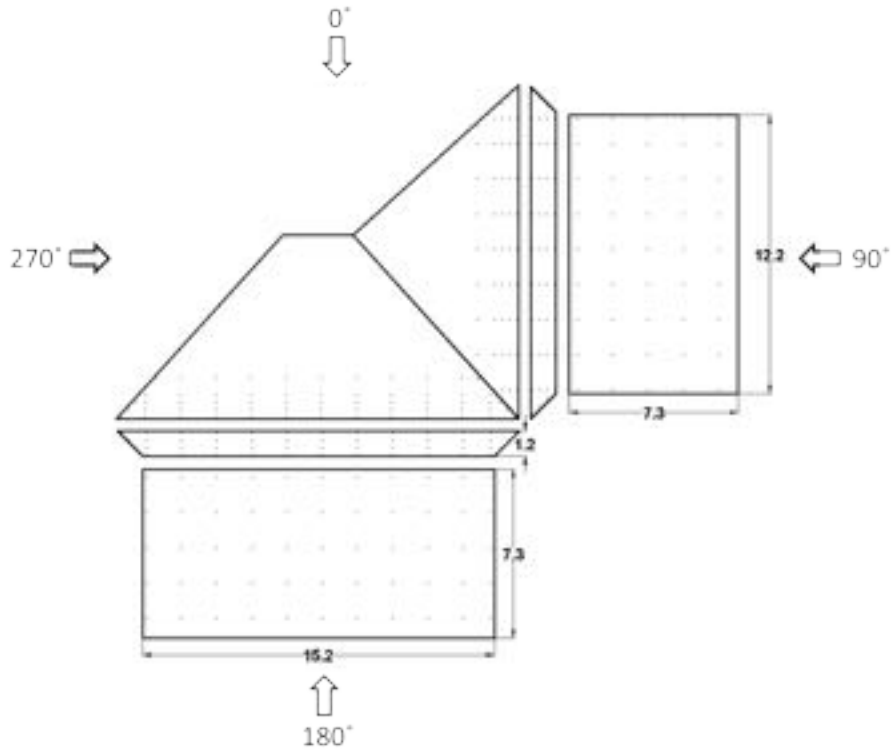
13: Pressure taps layout on walls, soffits, and roof with overhangs of 1.2 m (m) – Model E
